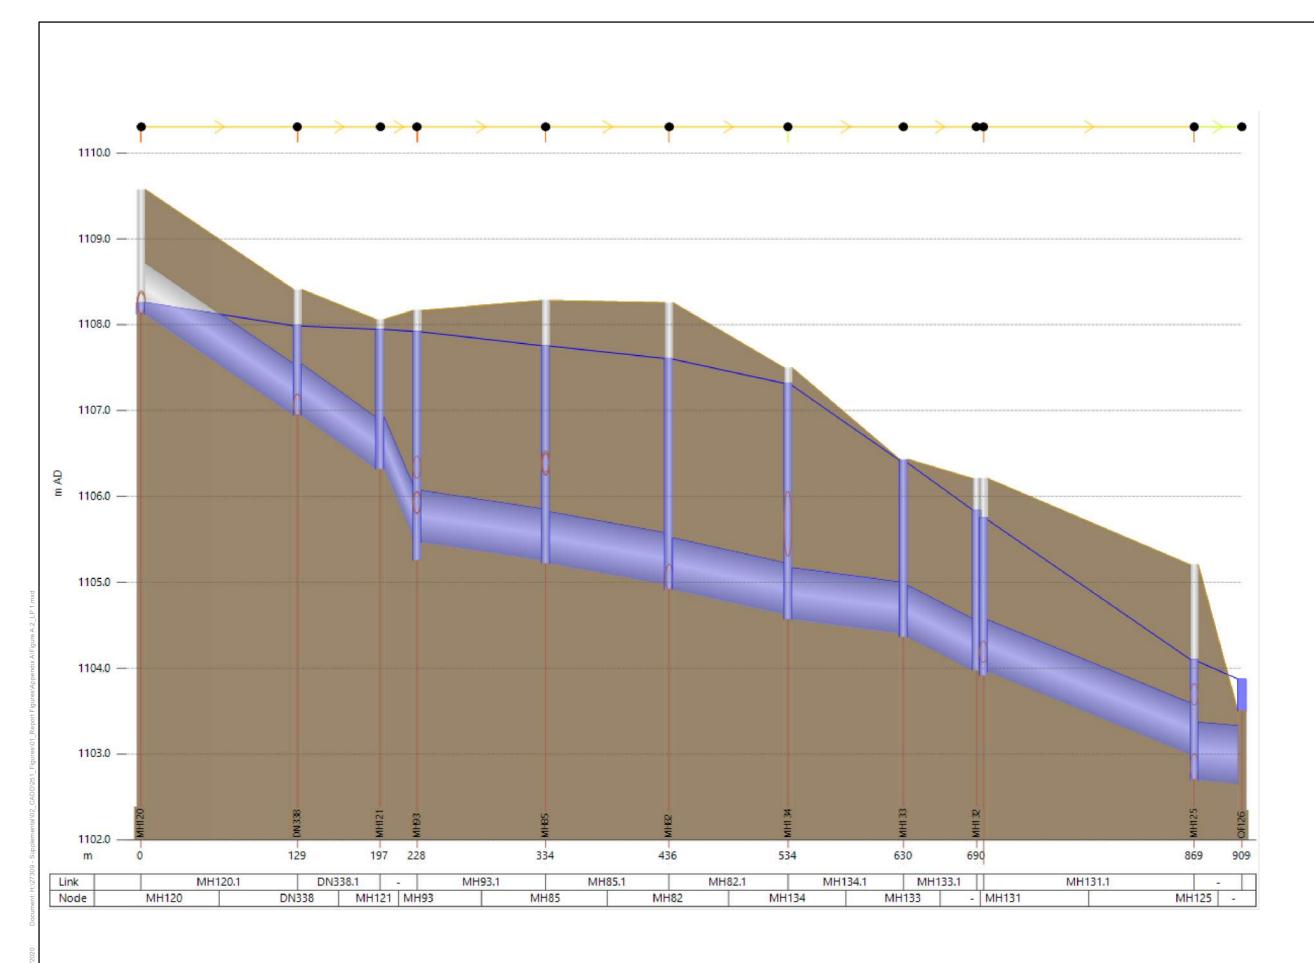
LONGITUDINAL PROFILE KEY PLAN CROSSFIELD STORMWATER MASTER PLAN
